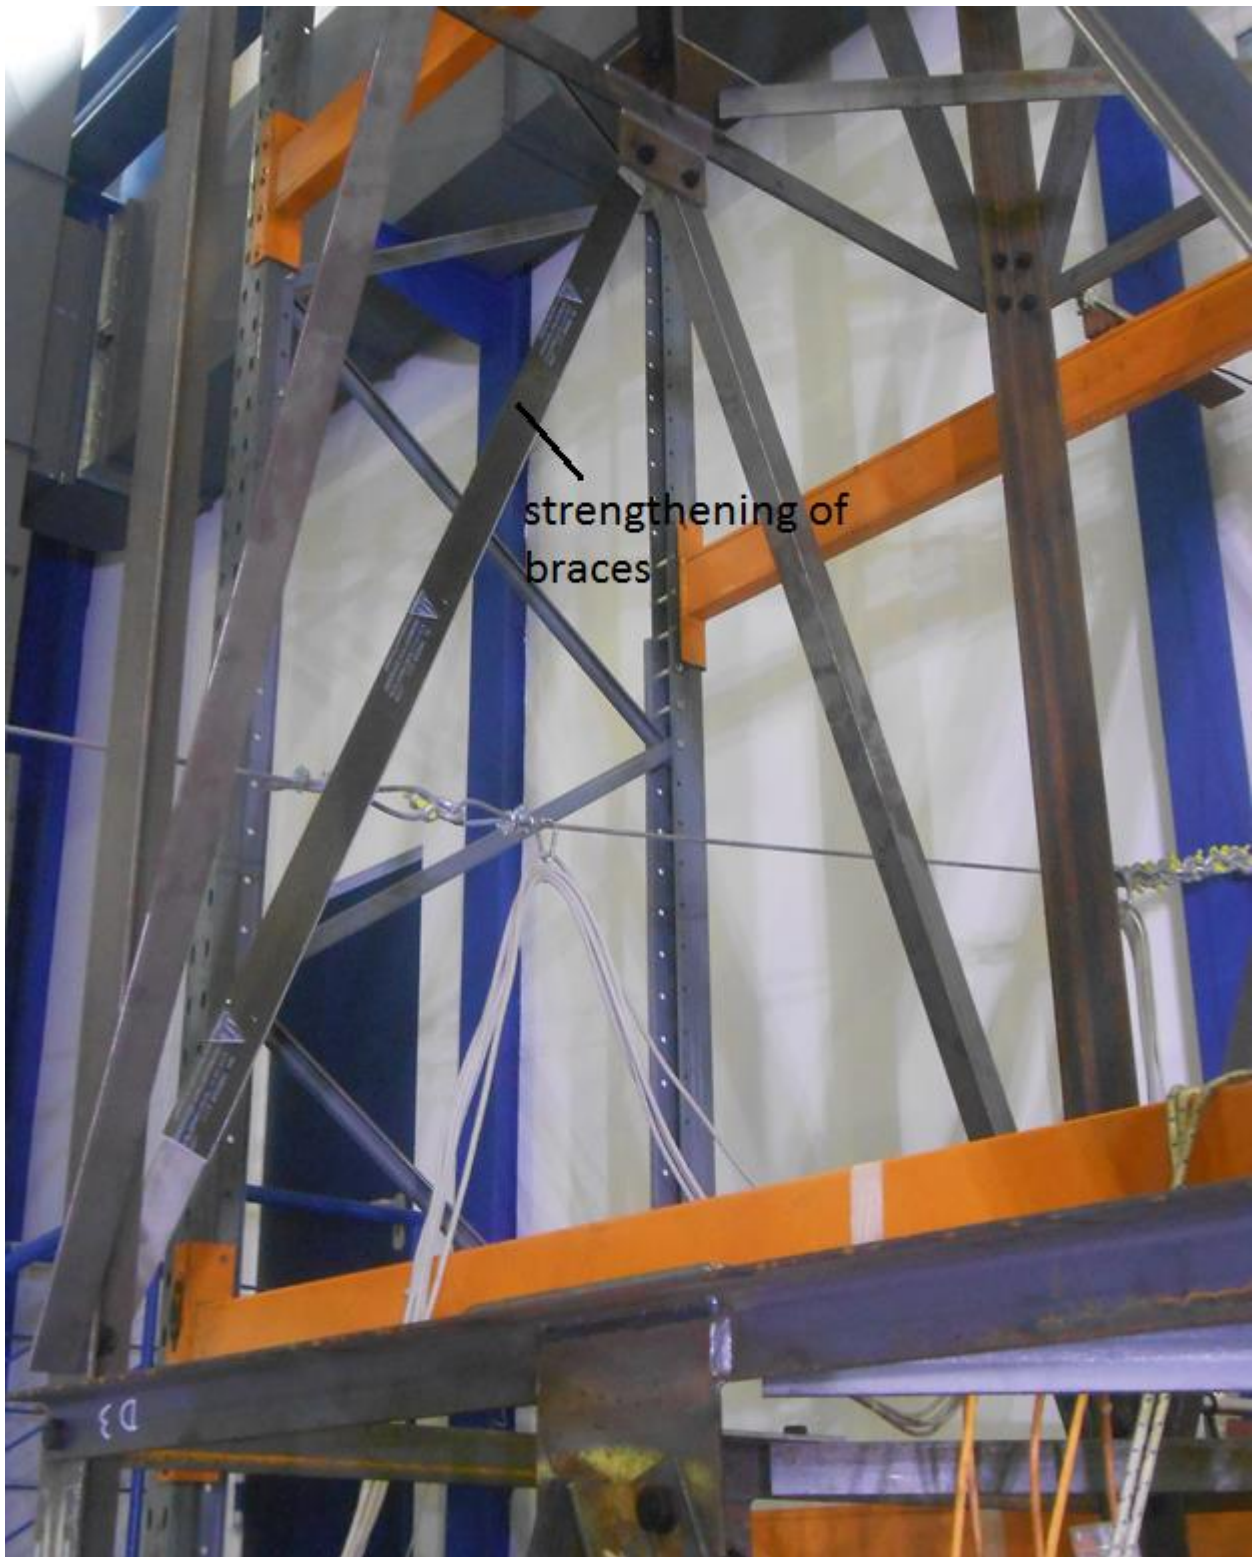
Strengthening of tower legs and bracing members by CFRP plates
